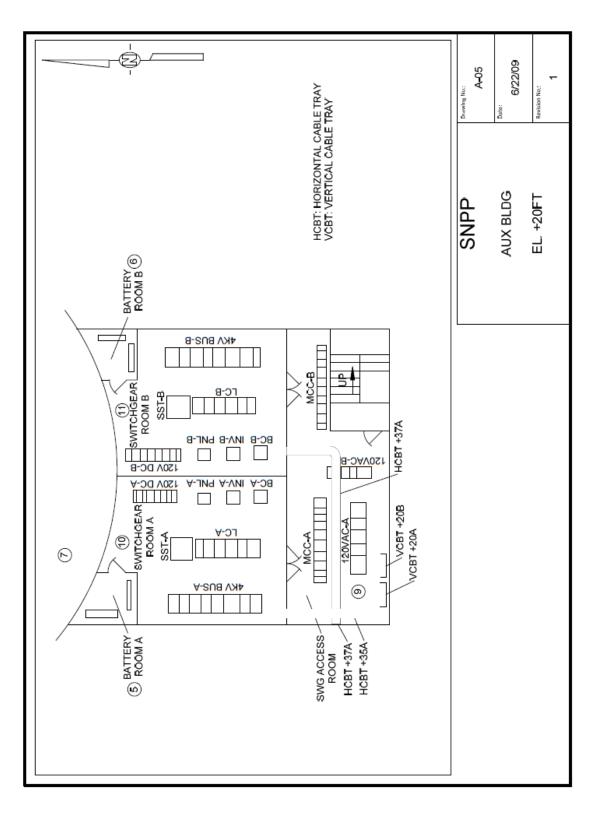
Auxiliary Building – Elevation +20 Ft.
